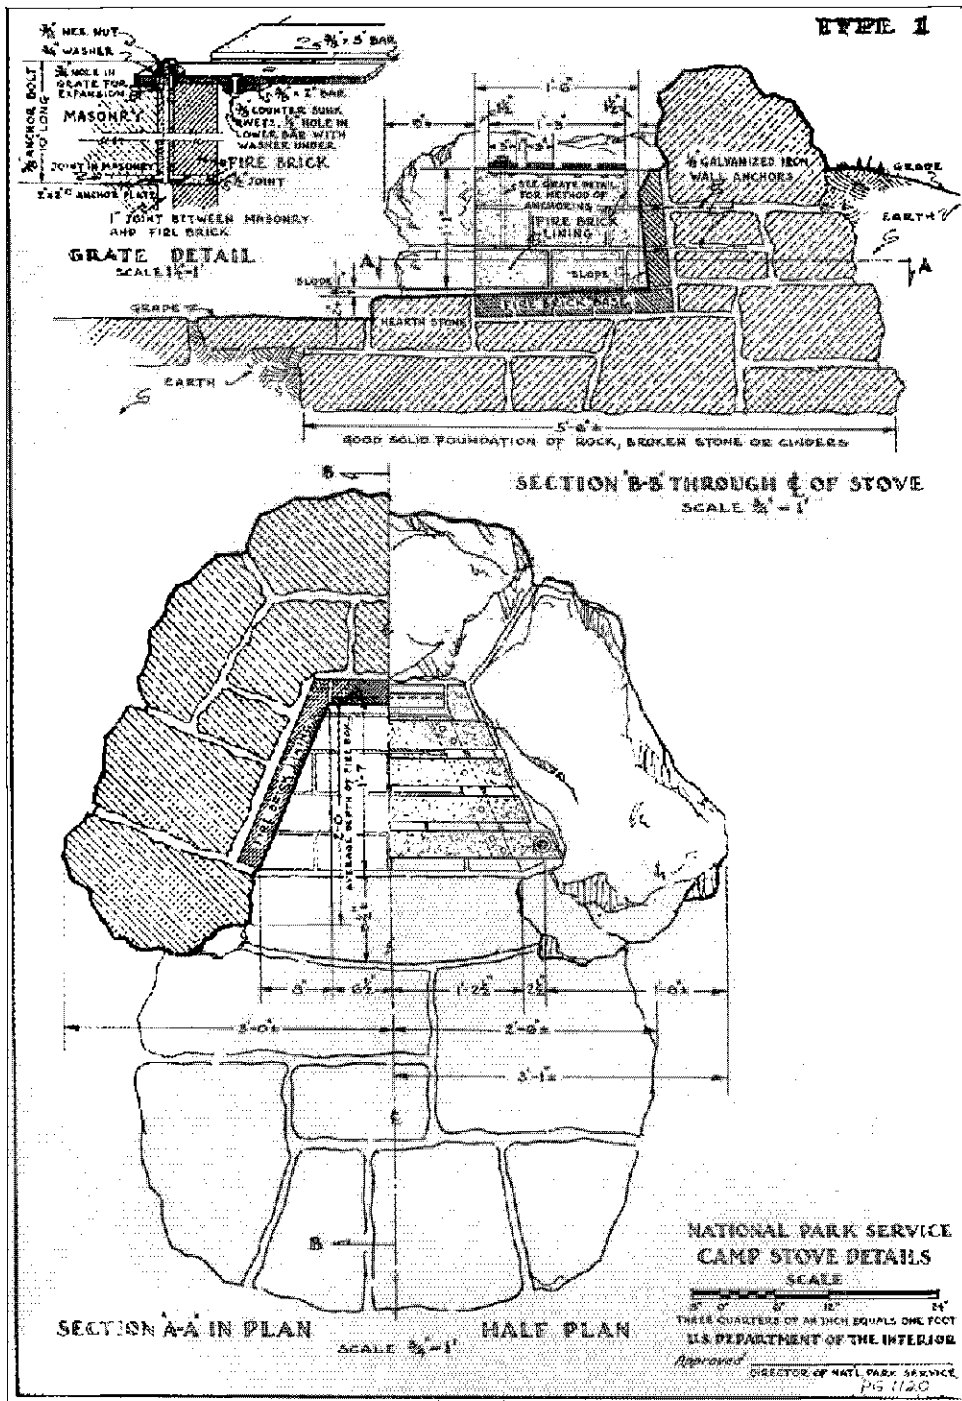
Camp Stove Details, Drawing for Type 1, c. 1938.
